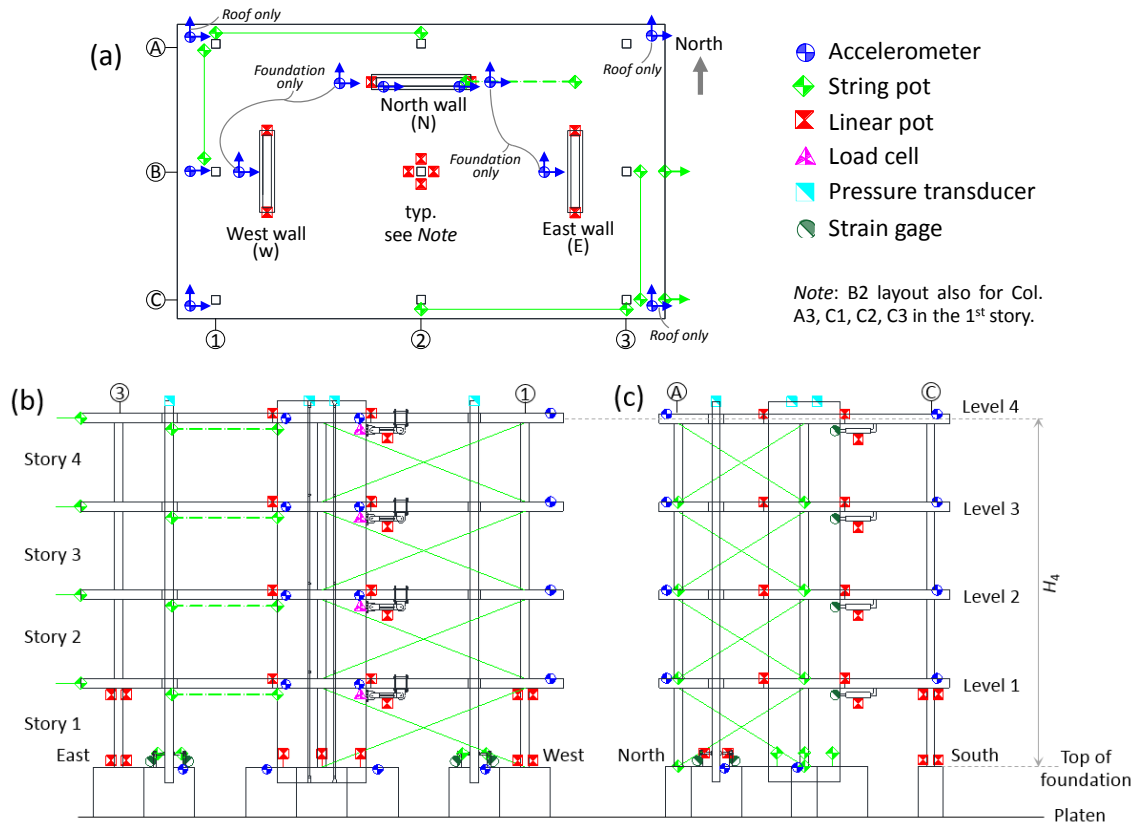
Typical instrumentation view: (a) Plan; Elevations: (b) North; (c) West.
